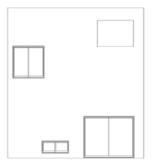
House In A Plum Grove Elevation 3 D 1.297 (Archi) and 1.247(Benoit)
